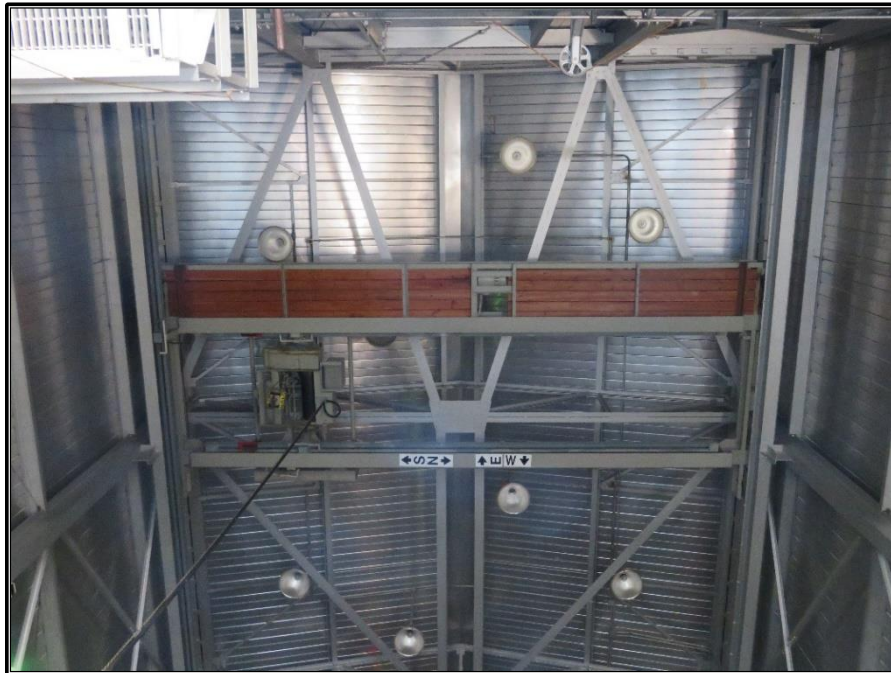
Ceiling of Building 7709 showing the bridge crane and wood-plank and aluminum platform.
